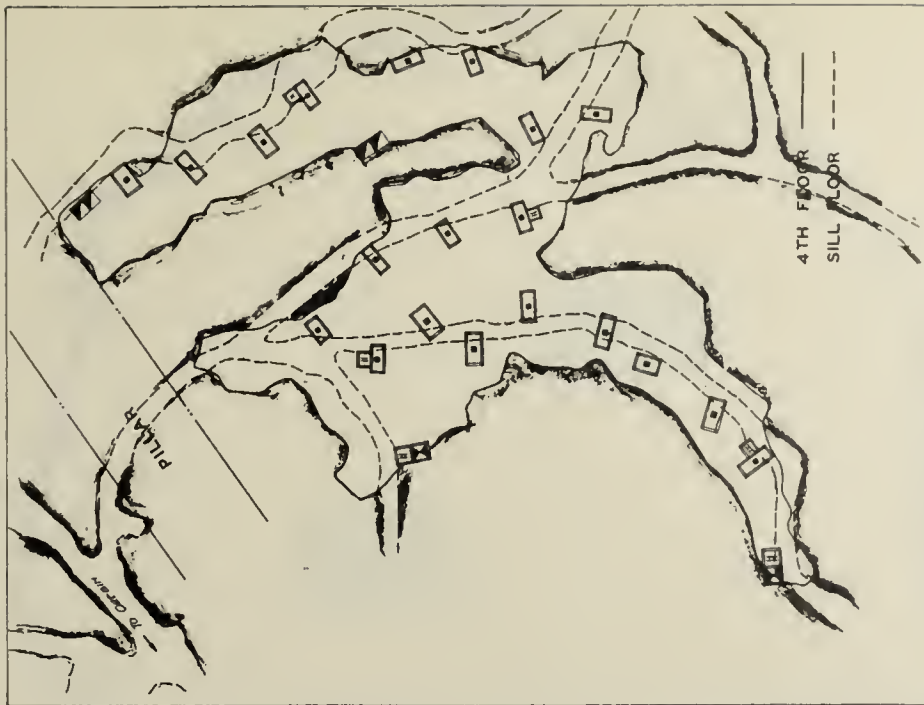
Typical cut-and-fill stope, showing drift, chute, and raise layout
